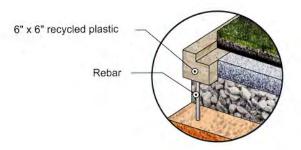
AIR FIELDTURF EDGING DETAIL CROSS SECTION
